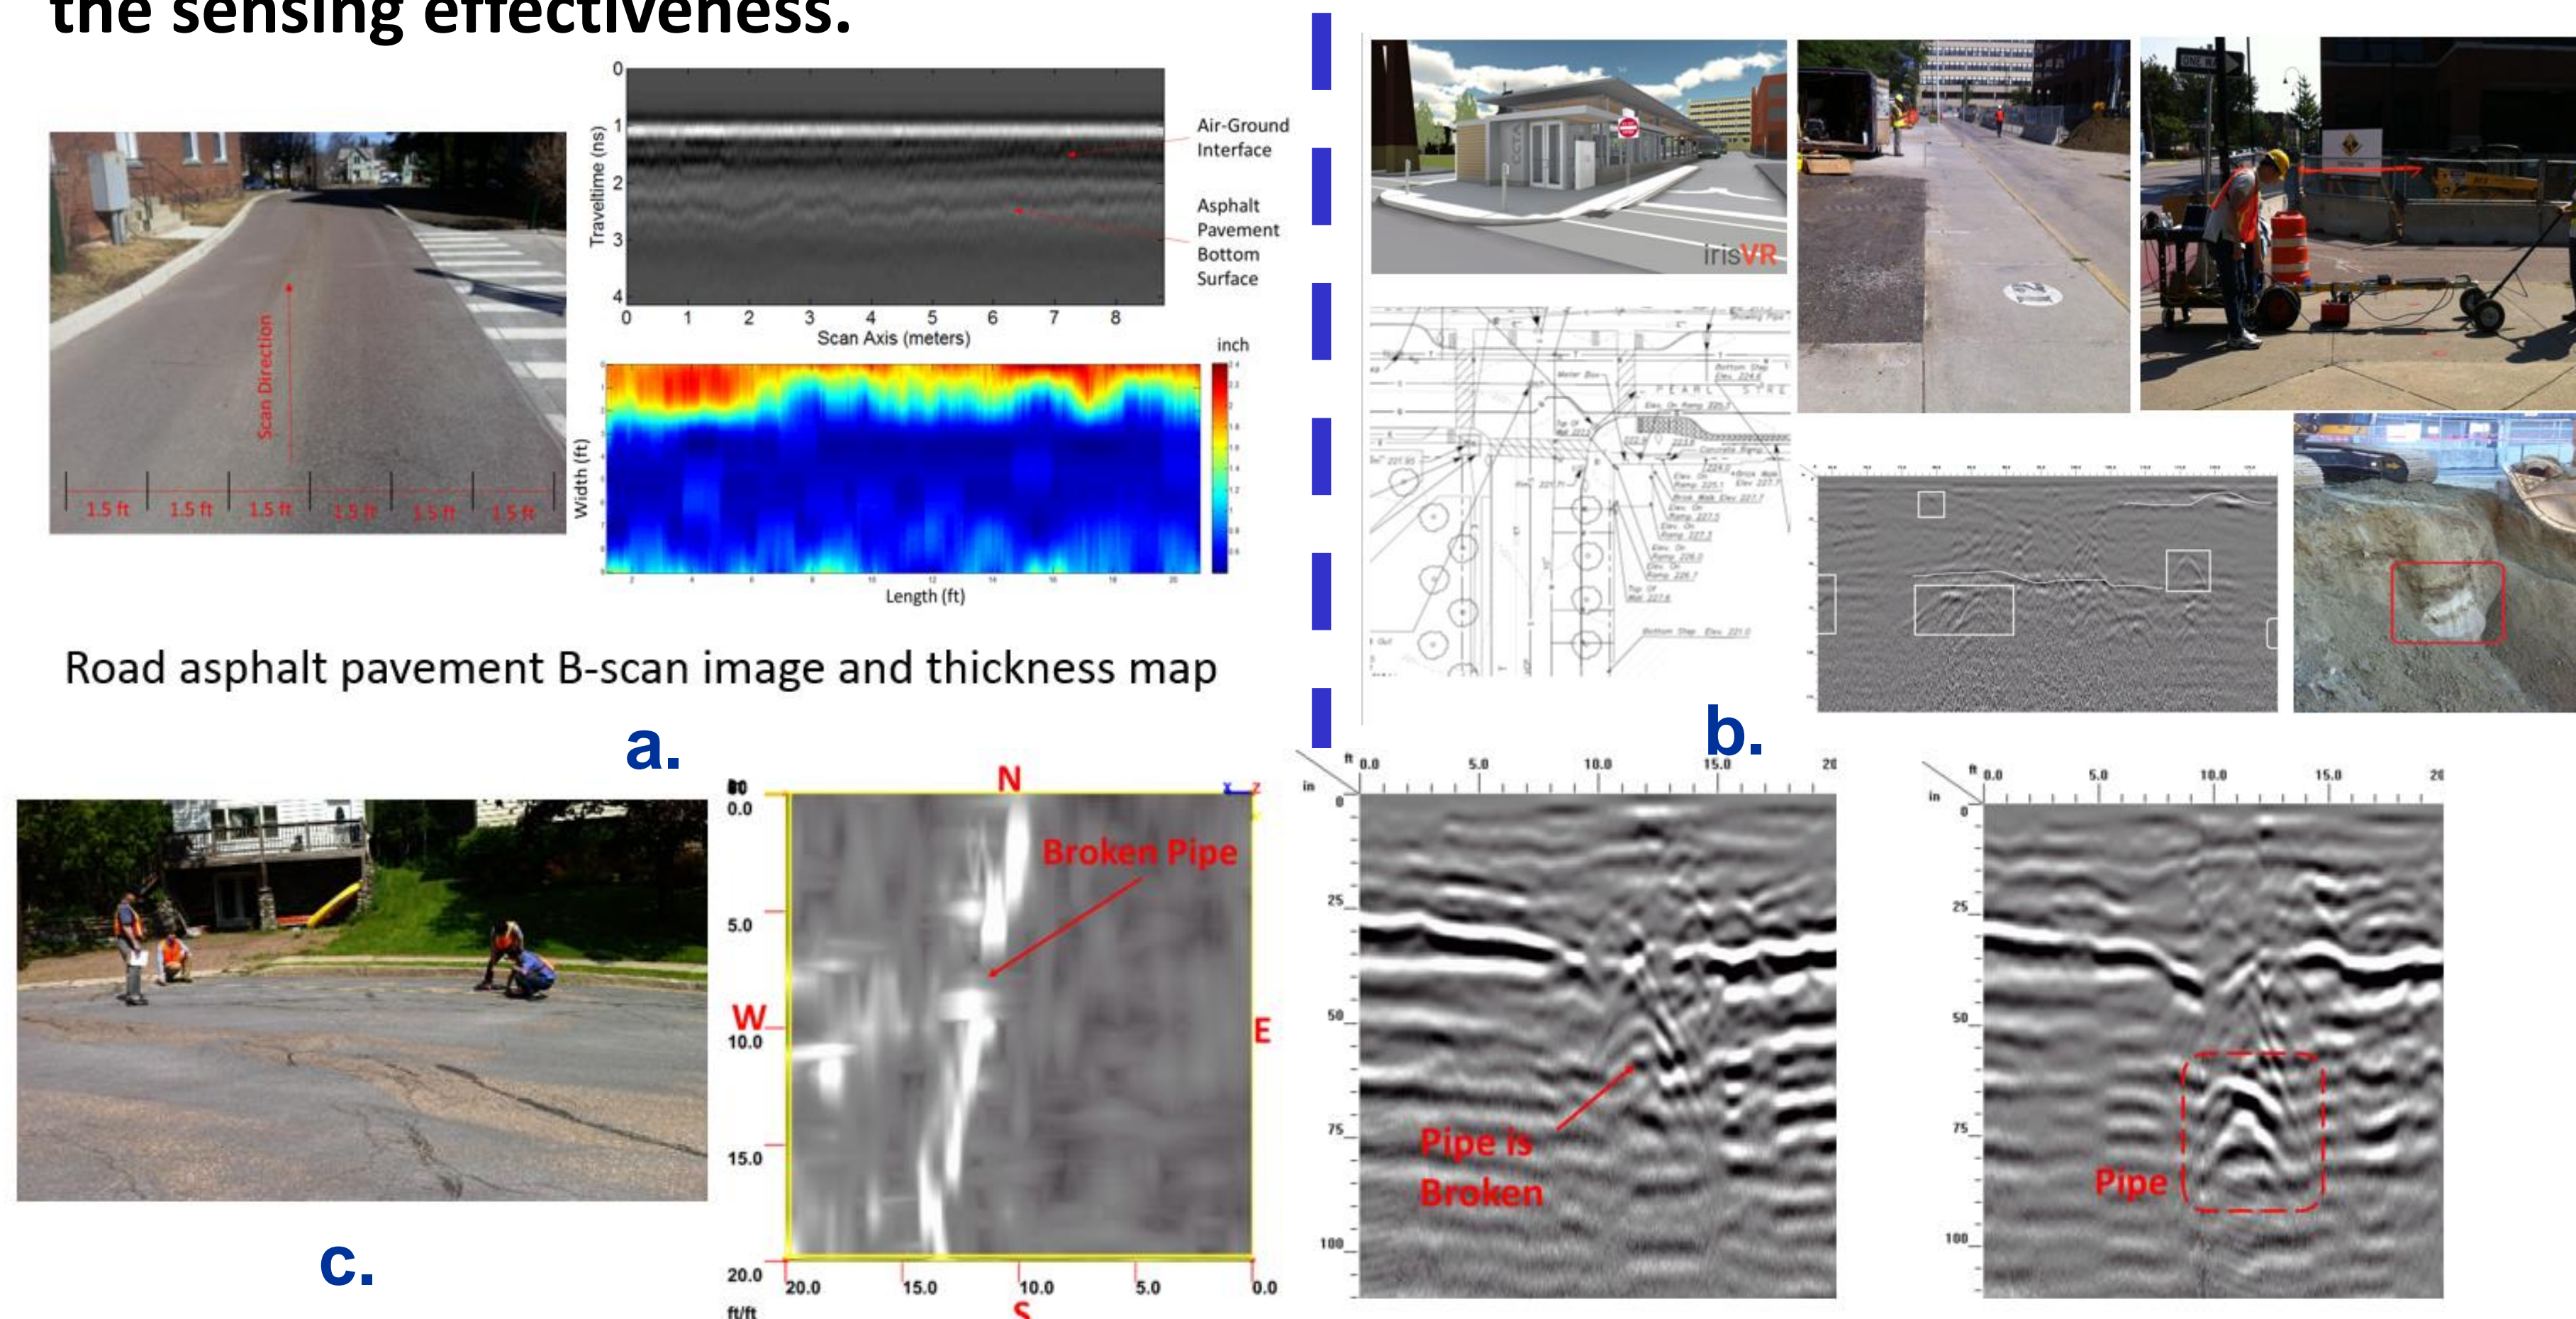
Field test: a). Road pavement test on campus; b). Road foundation structure survey – St. Paul Street, Burlington; c). Underground water pipe leakage detection - Winooski
